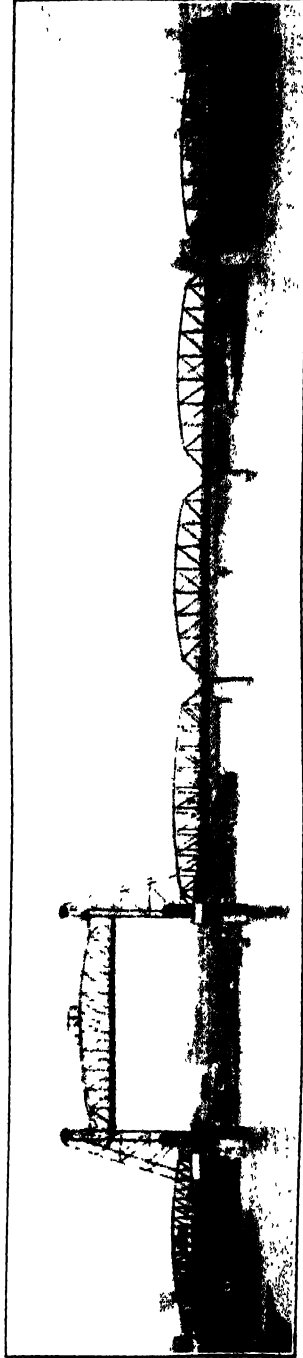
Hawthorne Avenue Bridge over the Willamette River at Portland, Ore.—Lifting Span Up.
